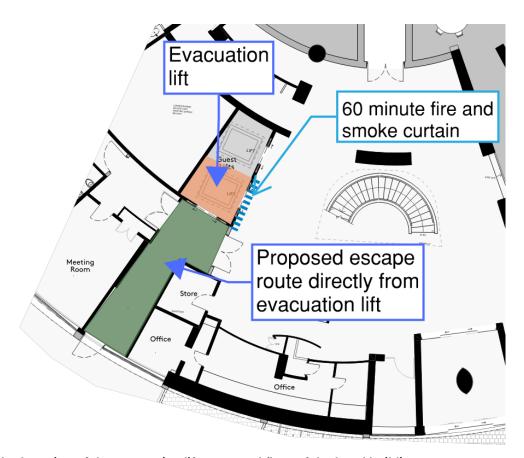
Location of the evacuation lift at ground floor of the hotel building
